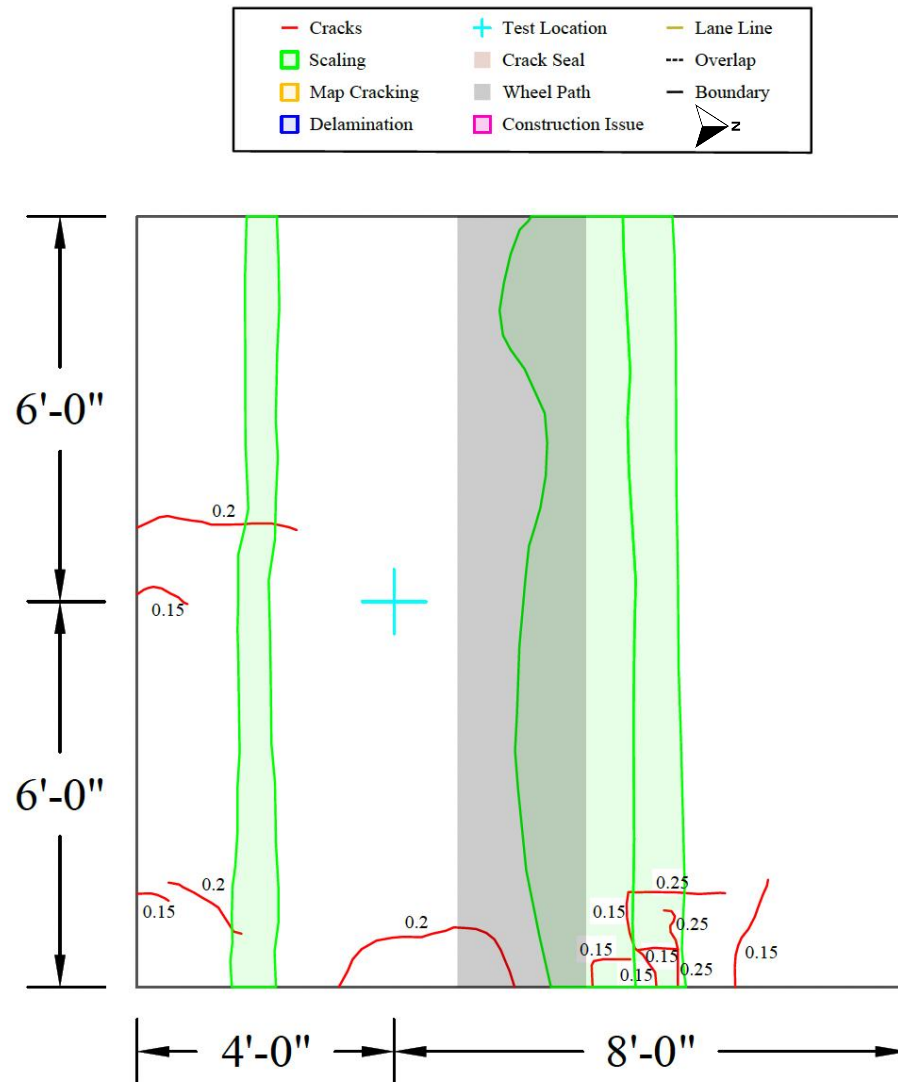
Test location 3 of lightweight concrete deck at bridge C-1011.
